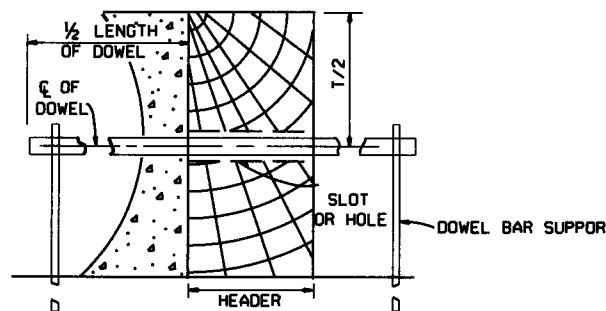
DETAIL OF JOINT SUPPORT FOR EXPANSION JOINTS
